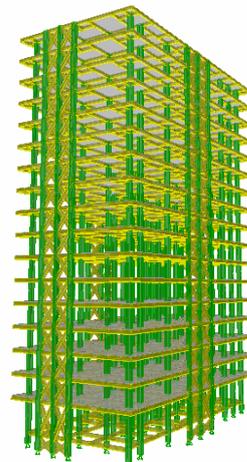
Elevation view of building with soft story at bottom with Bracing in ETABS
